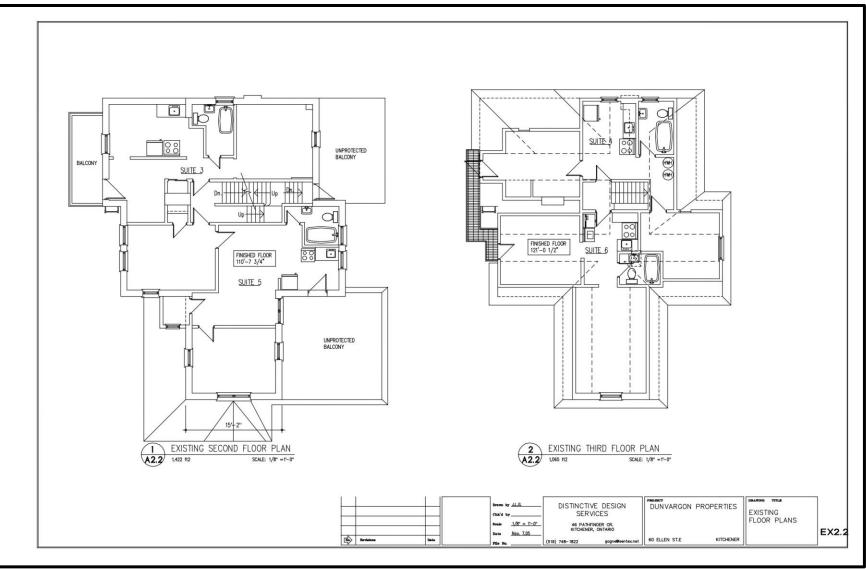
Existing Second and Third Floor Plan (Distinctive Design Services 2005)
